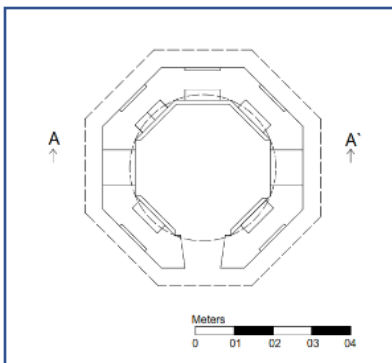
Floor Plan – Hindu temple on Chakiah Road
